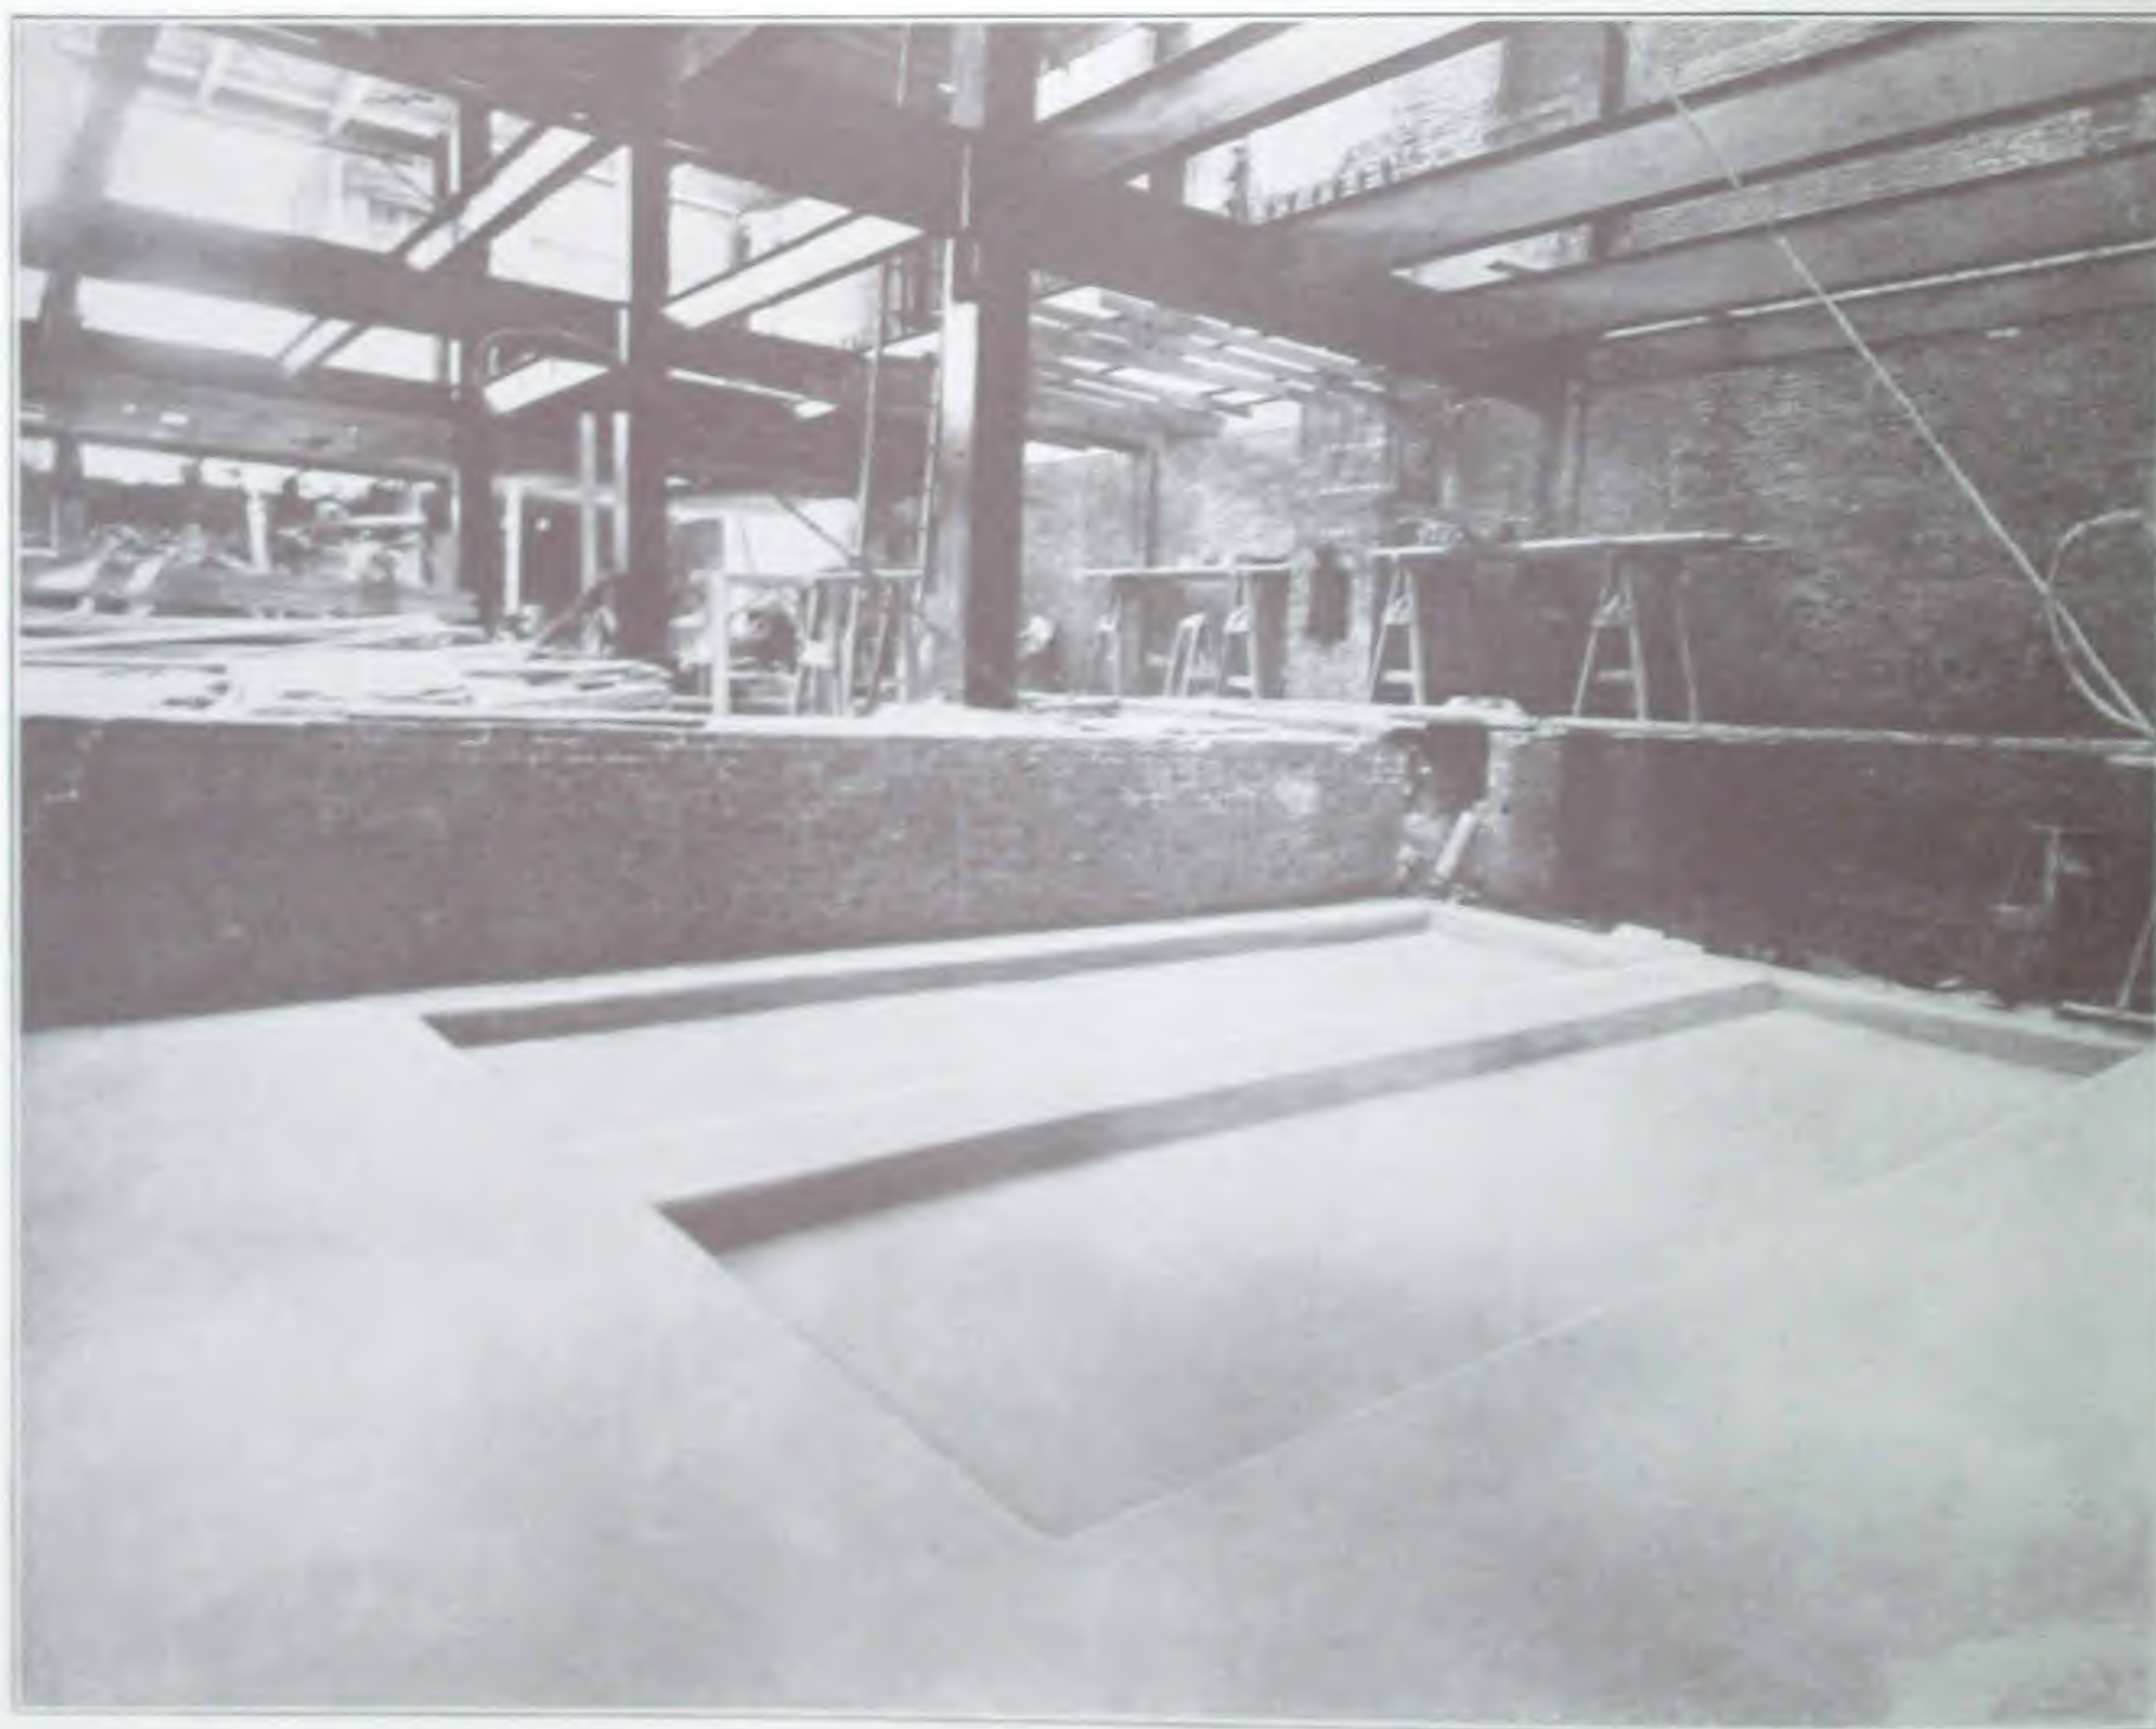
View Showing Depression in Floor for Protective Coat Under Boilers. Alan Realty Building, 17th Street and Broadway, New York City. Gen. and Edw. Blum, Architects. Alan Realty Const. Co., Owners and Builders.
